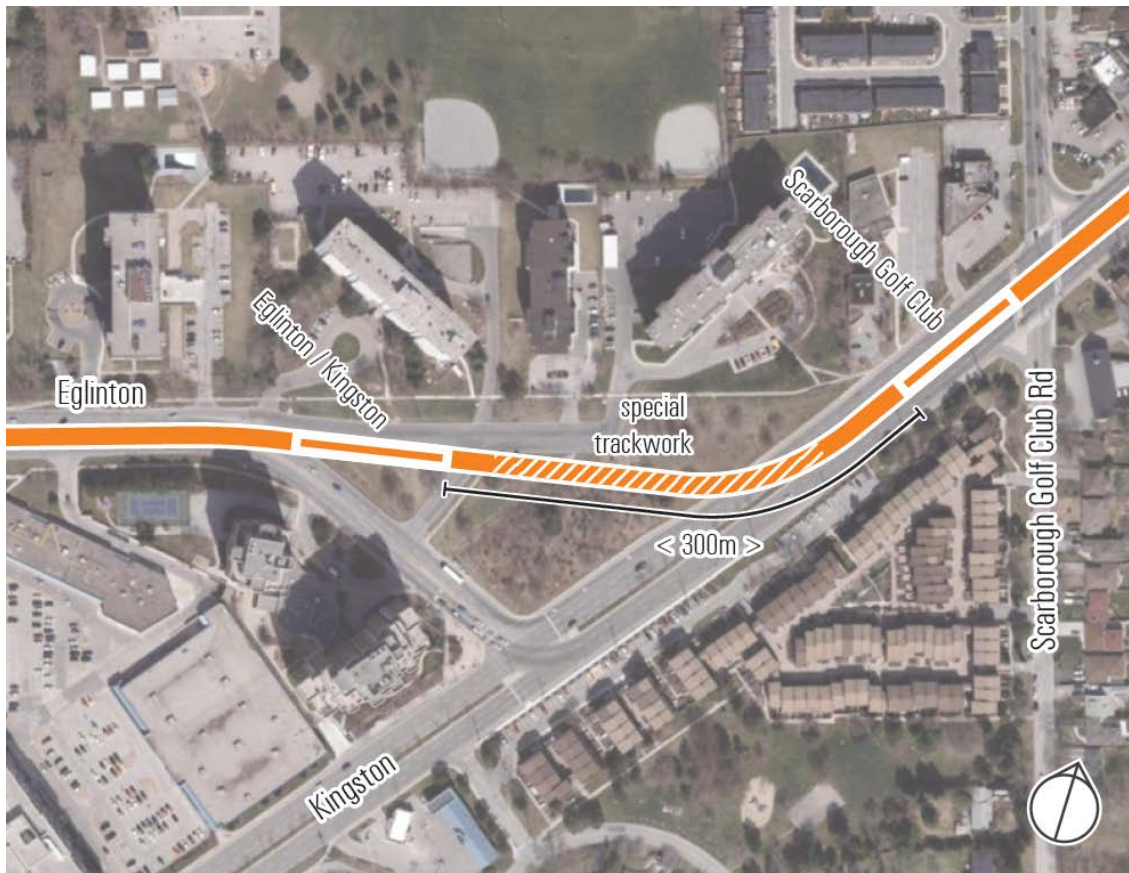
A: Approved SMLRT alignment at Eglinton Avenue and Kingston Road
